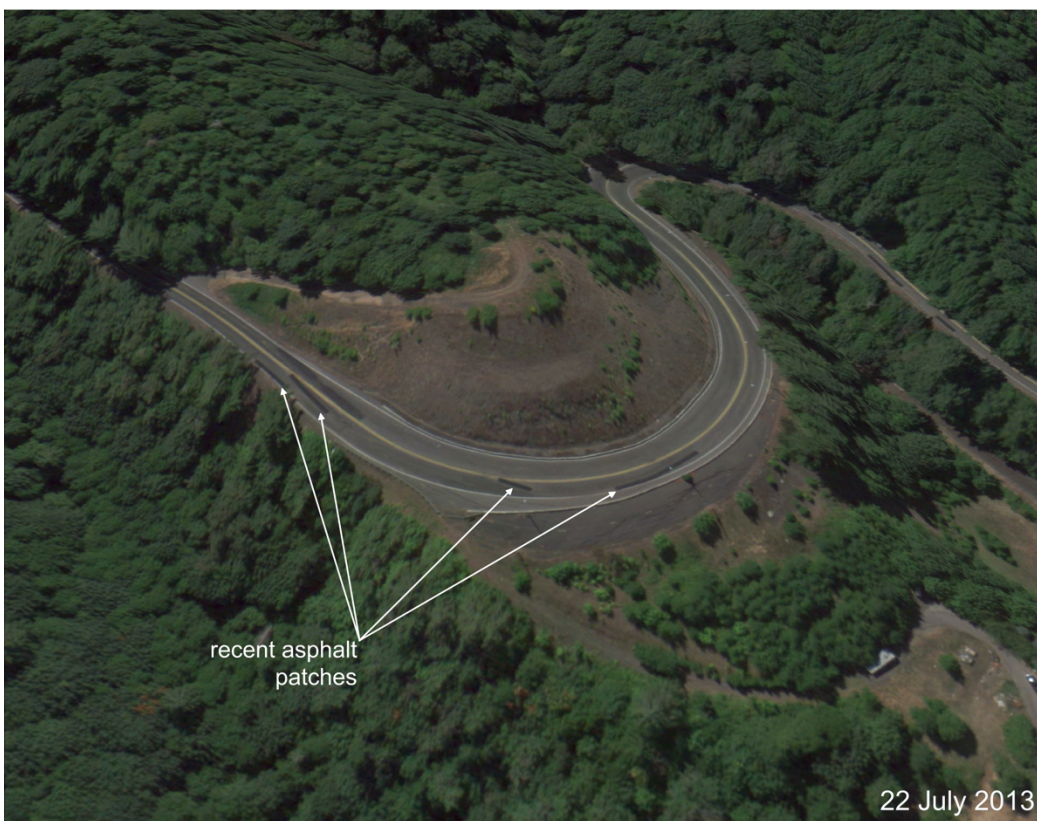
Multiple set of slope parallel asphalt patches suggesting ongoing movement along a deep-seated failure plane
